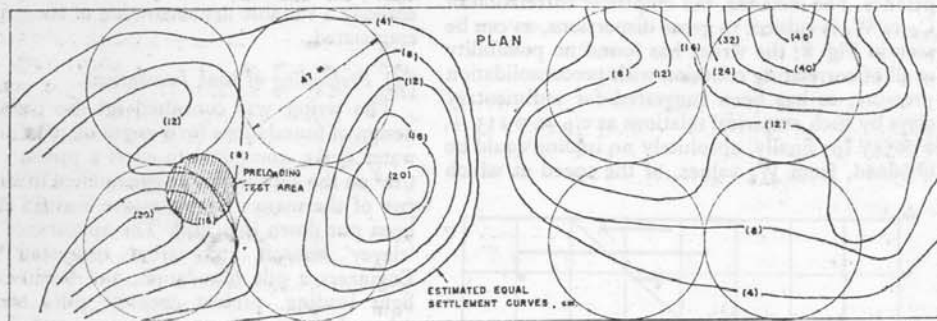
PRELOADING OF TANK FOUNDATIONS
